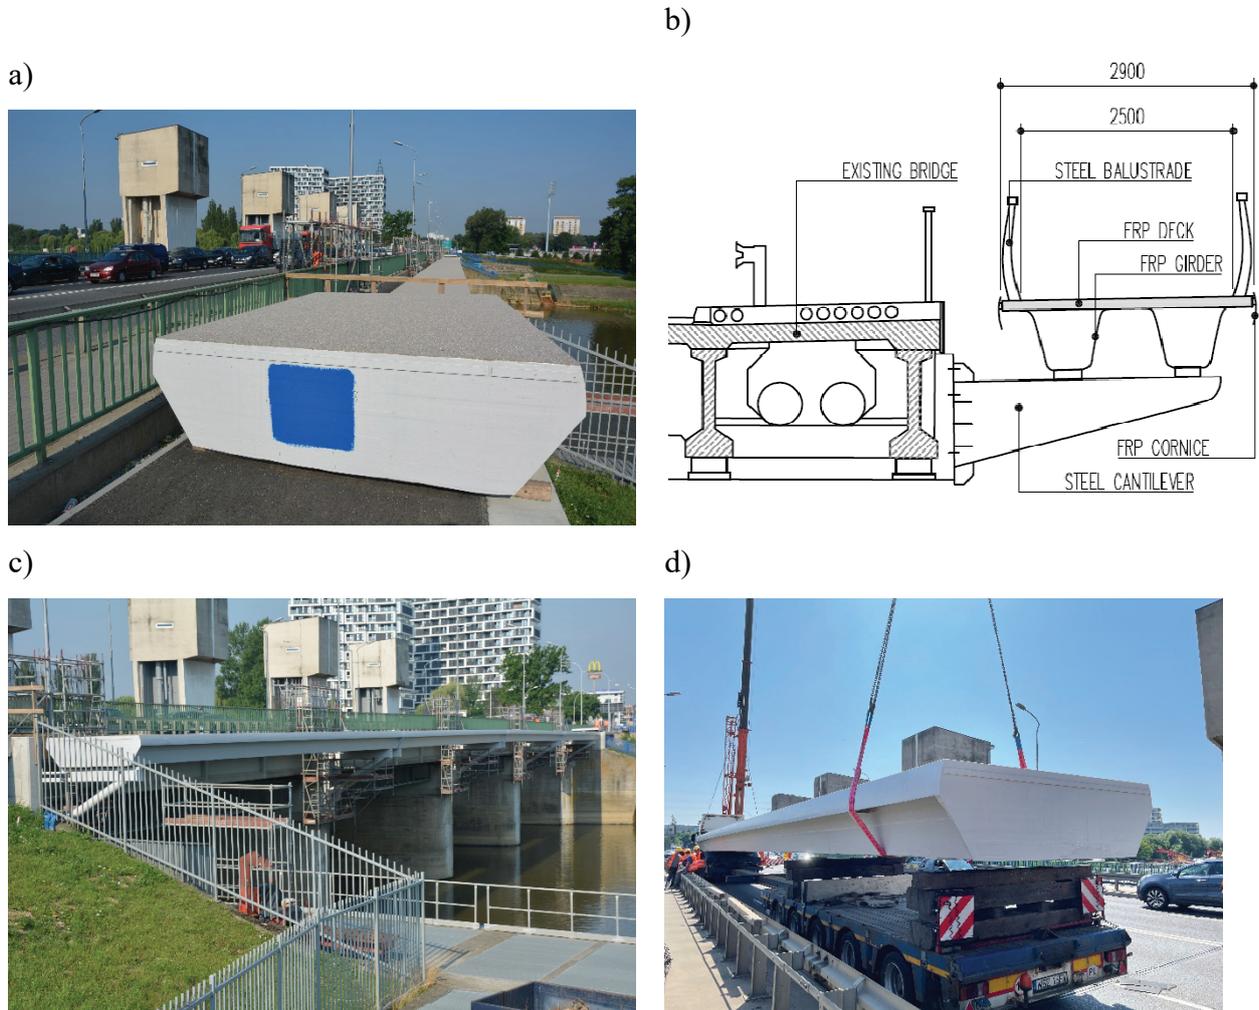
Footbridge under construction and cross section of the cantilever with FRP deck
